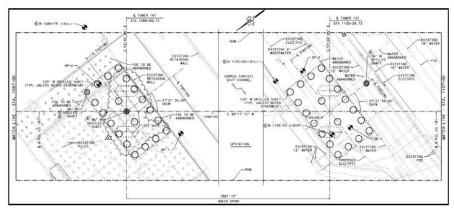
Plan View of Main Tower Foundation Caps at 1NT and 1^{ST} – Schematic Provided by Others
